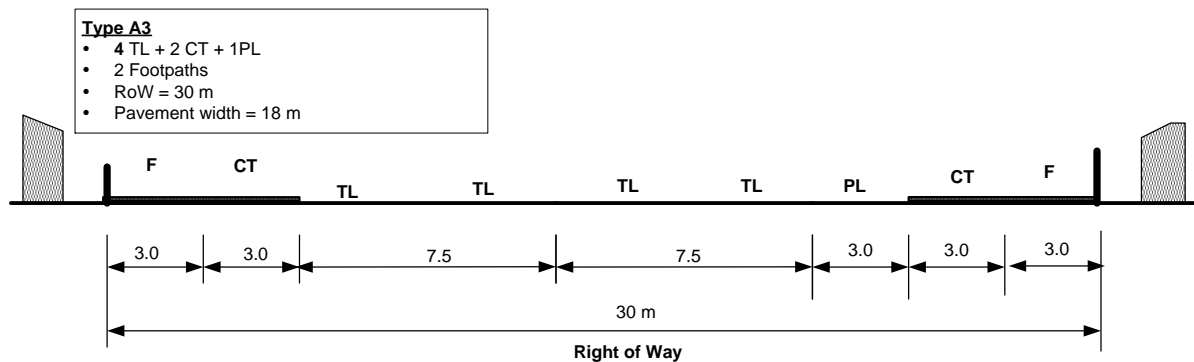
Typical cross-section of Sub-Arterial (Feeder Roads)
